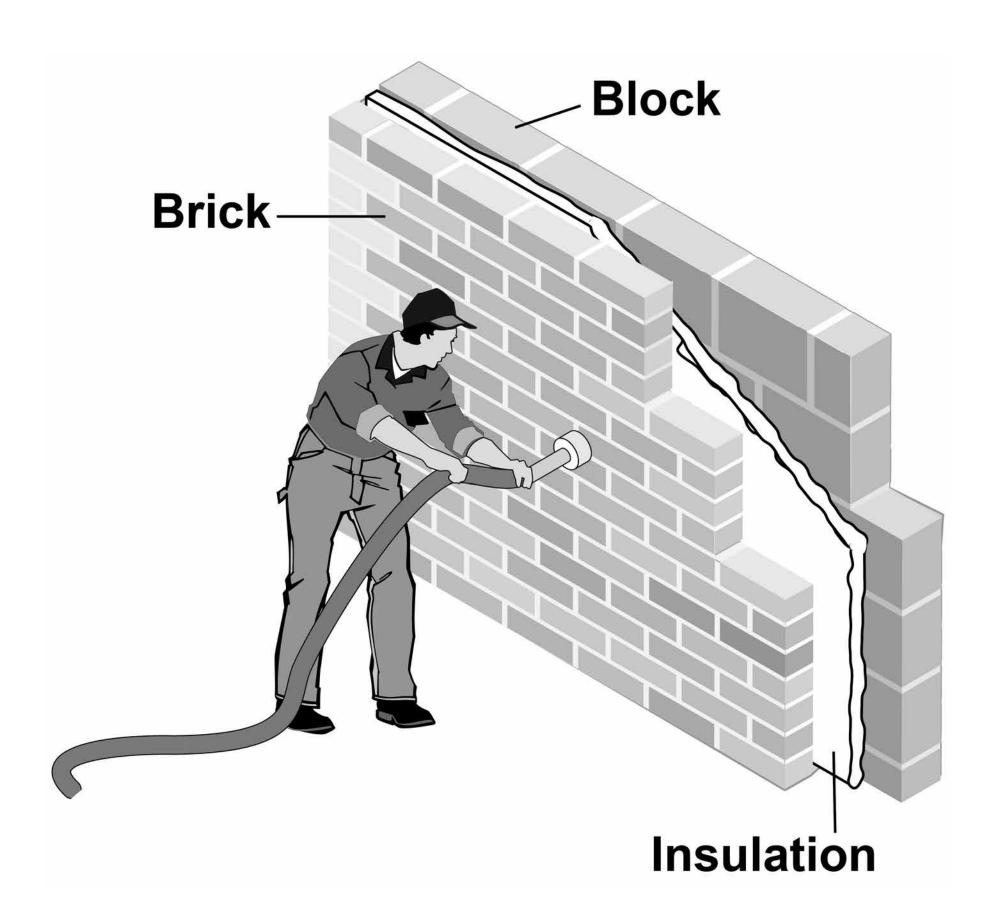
shows cavity wall insulation being installed in the wall of a house.
